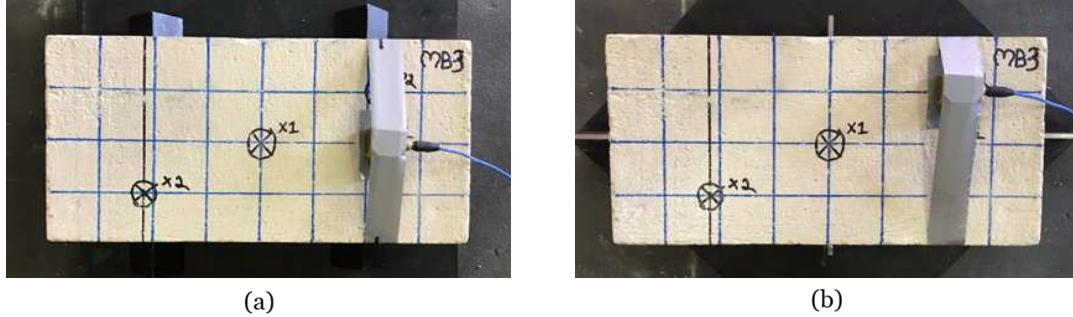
Accelerometer mounting using scrim-backed adhesive tape for (a) flexural test set-up and (b) torsional test set-up of IEV tests.
